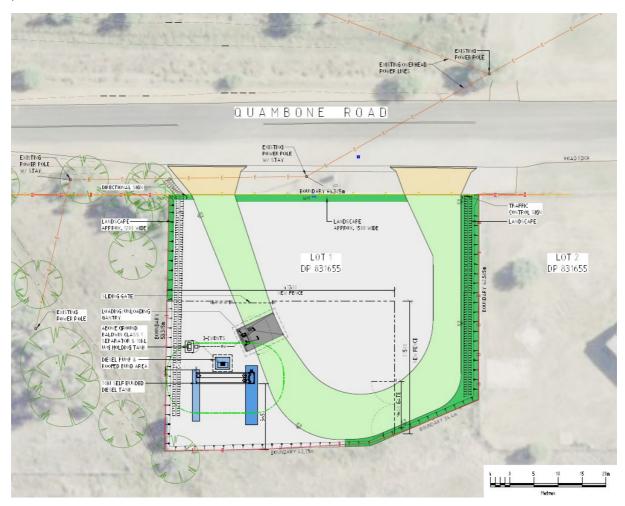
Proposed Site Layout (Source: TfA Project Group)
